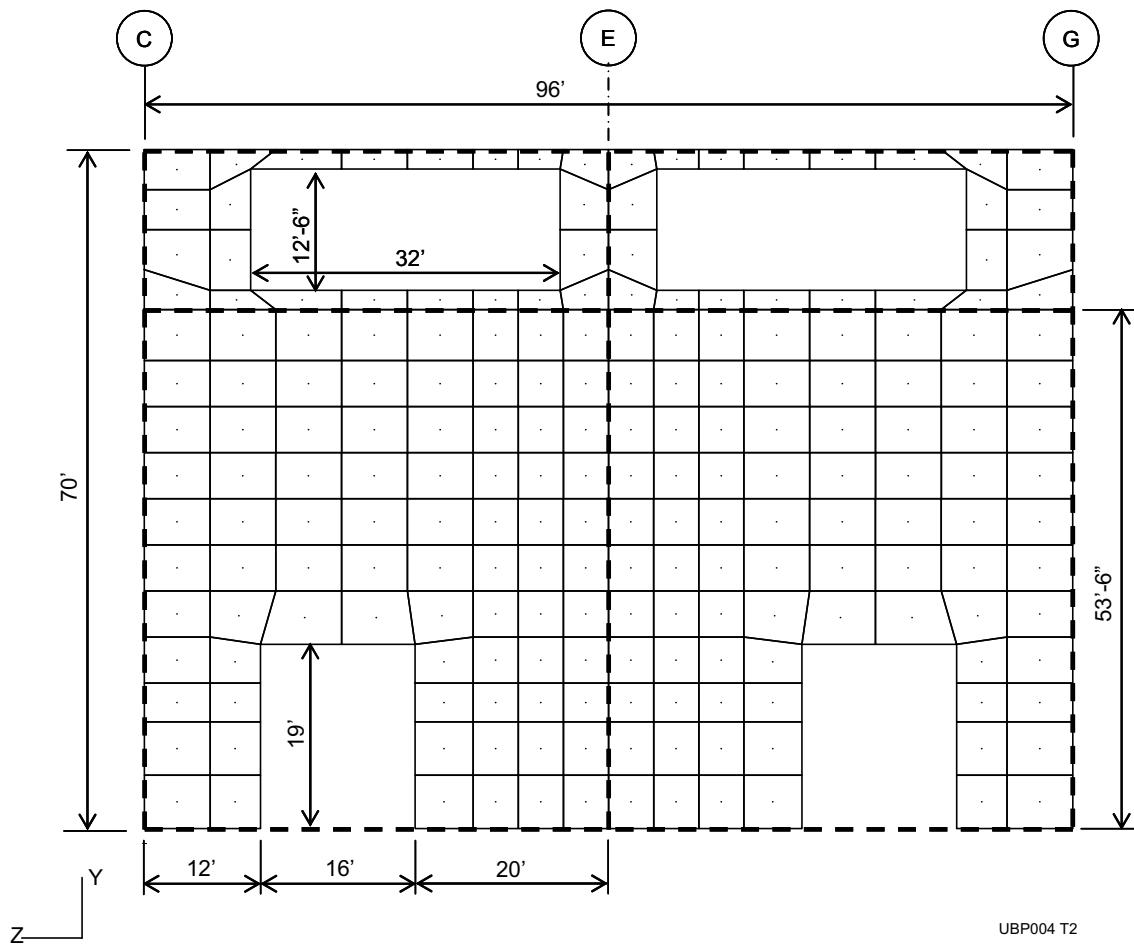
E.2-4—EPGB Wall at Column Line 11 - GT STRUDL FEM
